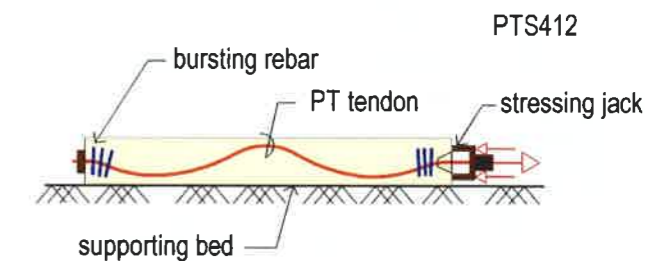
Post-Tensioned Member on Stressing Bed
